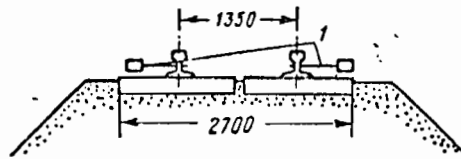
Track-stand cross section; (1) pin for attaching dial gauge.
